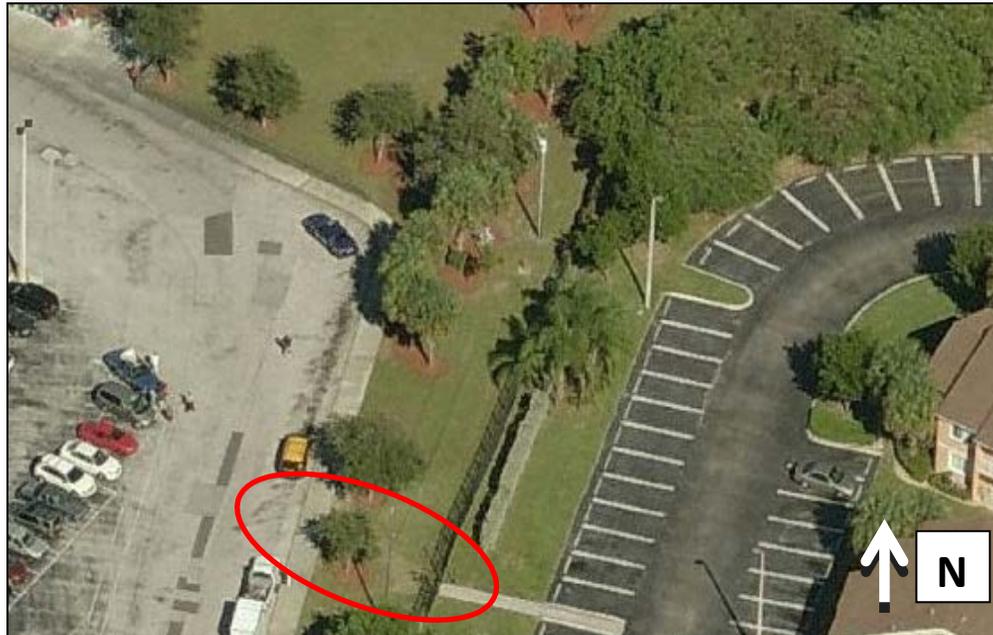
Townhome Sidewalk Connection (MP2) – Connect existing sidewalk by paving approximately 30 feet of sidewalk connection between adjacent housing and station sidewalk.
